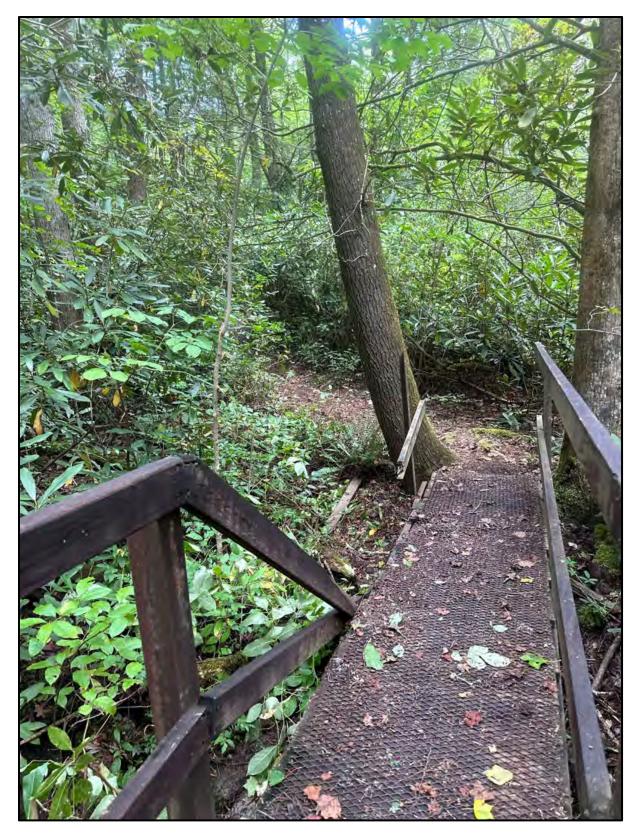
Trail Issue #9 - Coon Branch, Bridge (see Figure 4.3)
